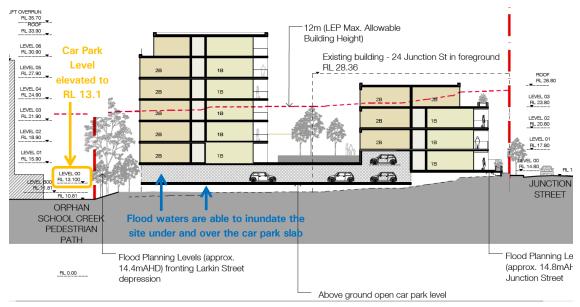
Section A-A of Indicative Scheme Source: Bates Smart Architects
